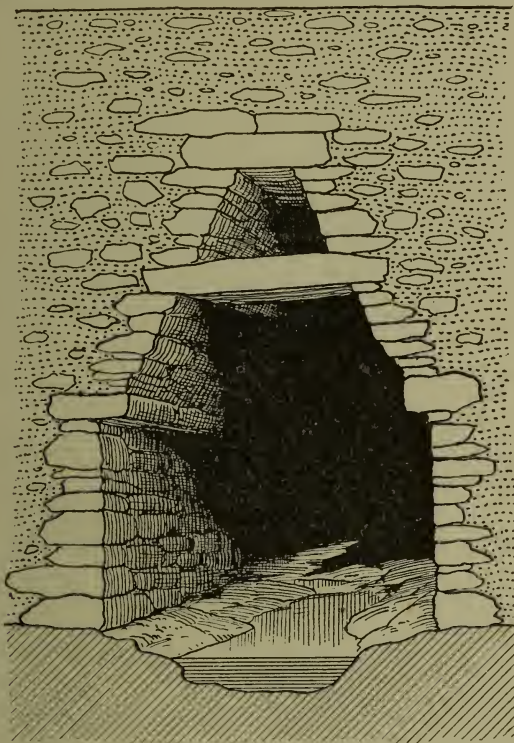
SECTION OF WATERWAY ARCH. HEIGHT 10 FEET.
